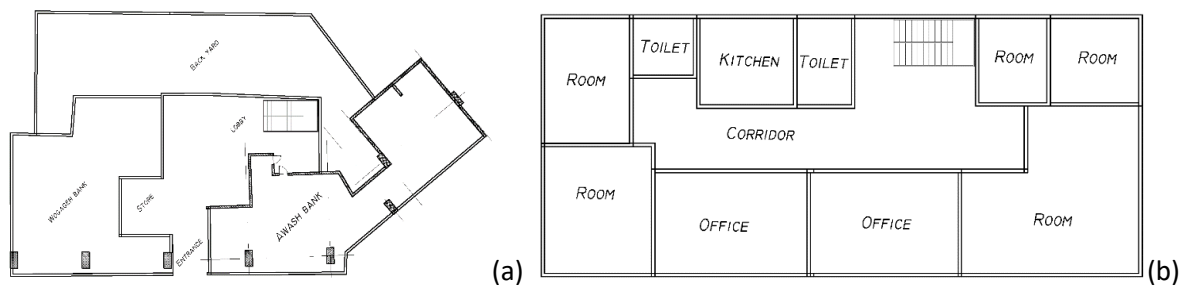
Lion House floor plans ((a) Ground and (b) Typical (First to Tenth))
